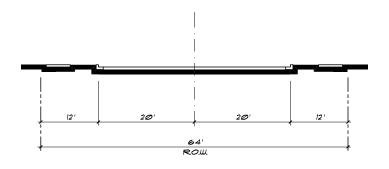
ROADWAY SECTIONS A1 & A2
